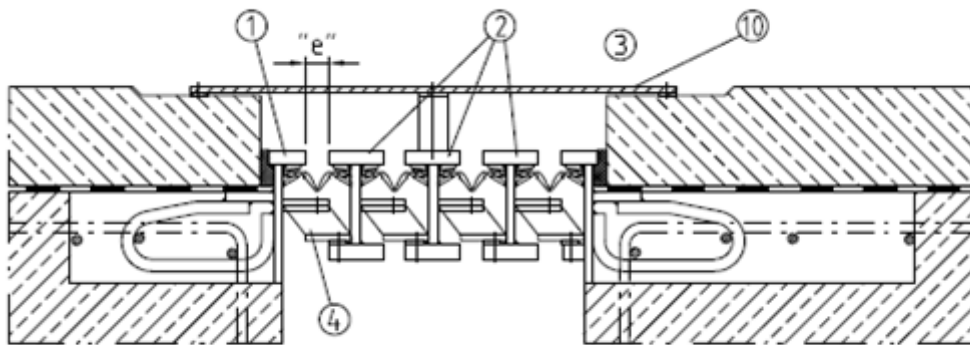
Cross section at footpath between crossbeams of single crossbeam modular expansion joint with shear control elements between centre beams and cover plate
